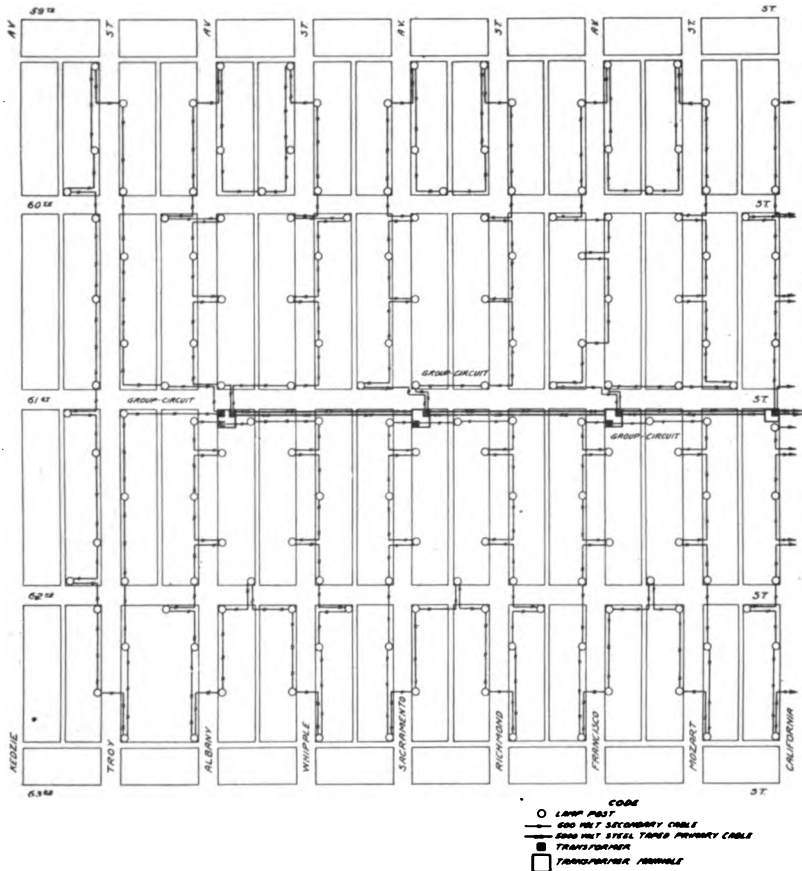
PLAN OF A TYPICAL RESIDENCE SECTION OF CHICAGO SHOWING LOCATION OF STREET LIGHTS.
